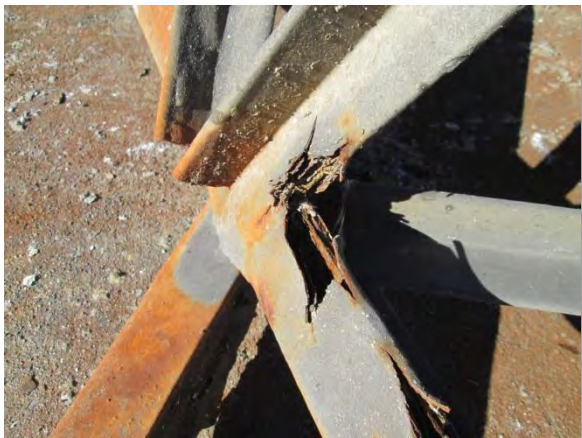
Typical coating failure and exfoliating corrosion products on PC 1 rake arms.
